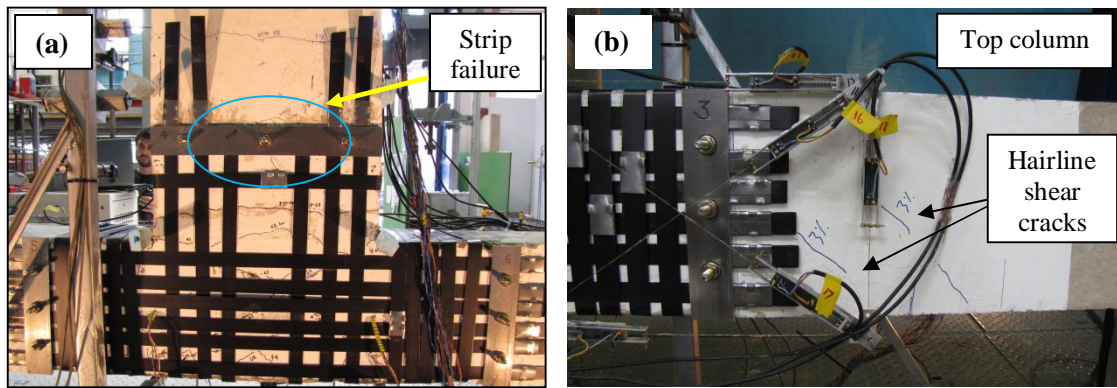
a) Strip failure from beam strengthening and b) hairline shear cracks in the top column
